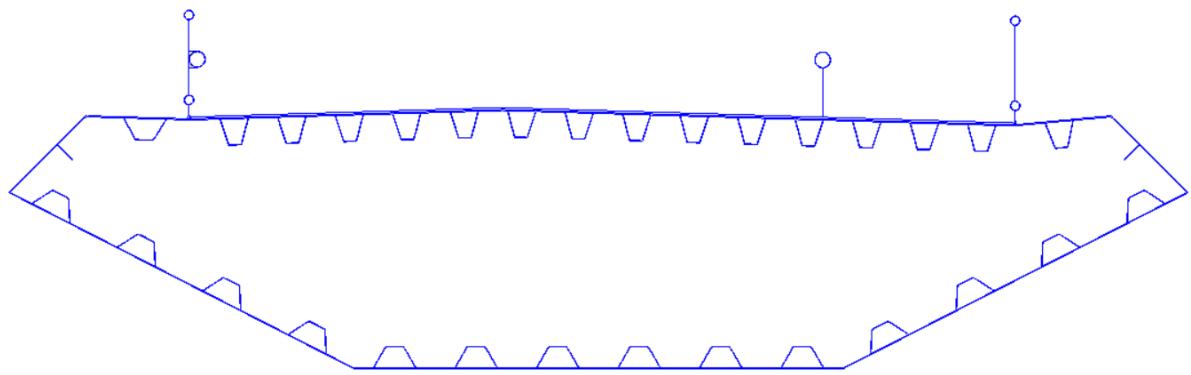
The girder cross-section included with modified railings and asphalt, created in FEM-Design
